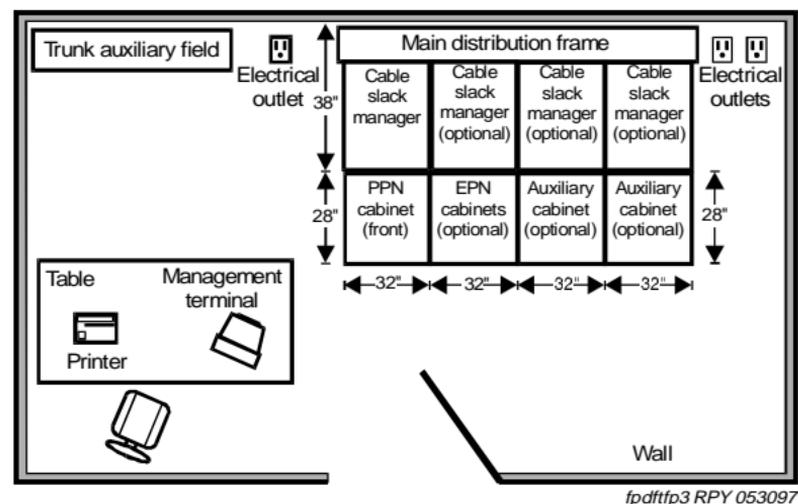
Typical Floor Plan with an additional EPN and Auxiliary Cabinets
